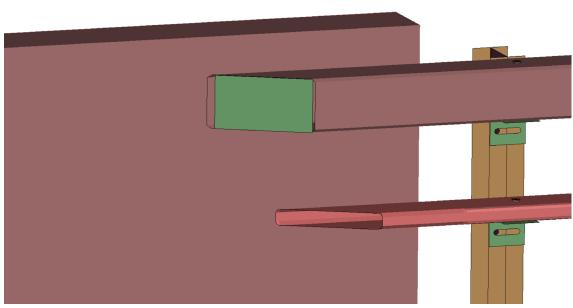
Box Beam Transition Connection to face of Vertical Concrete Parapet.
